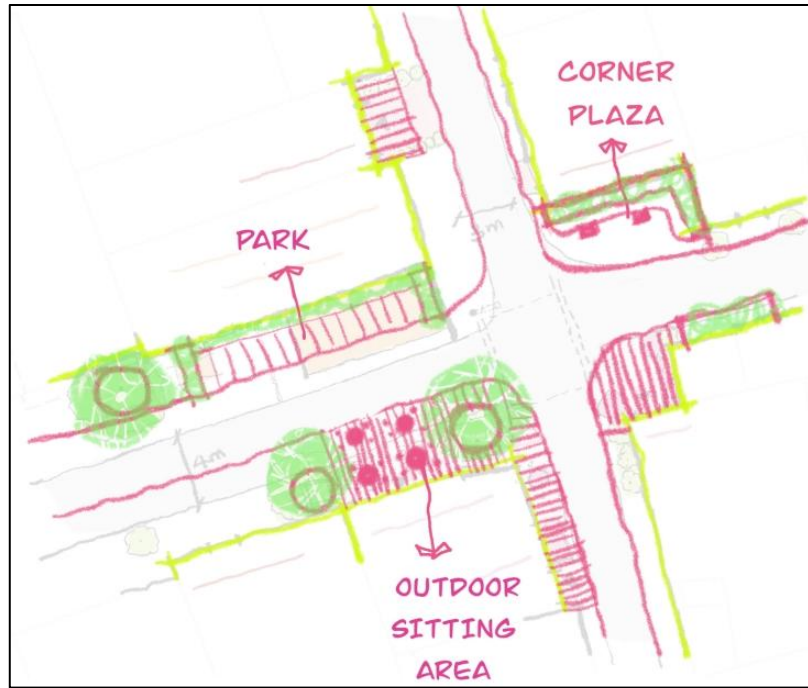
11 Qingyun Bridge Design Master Plan (Source: by the author)
